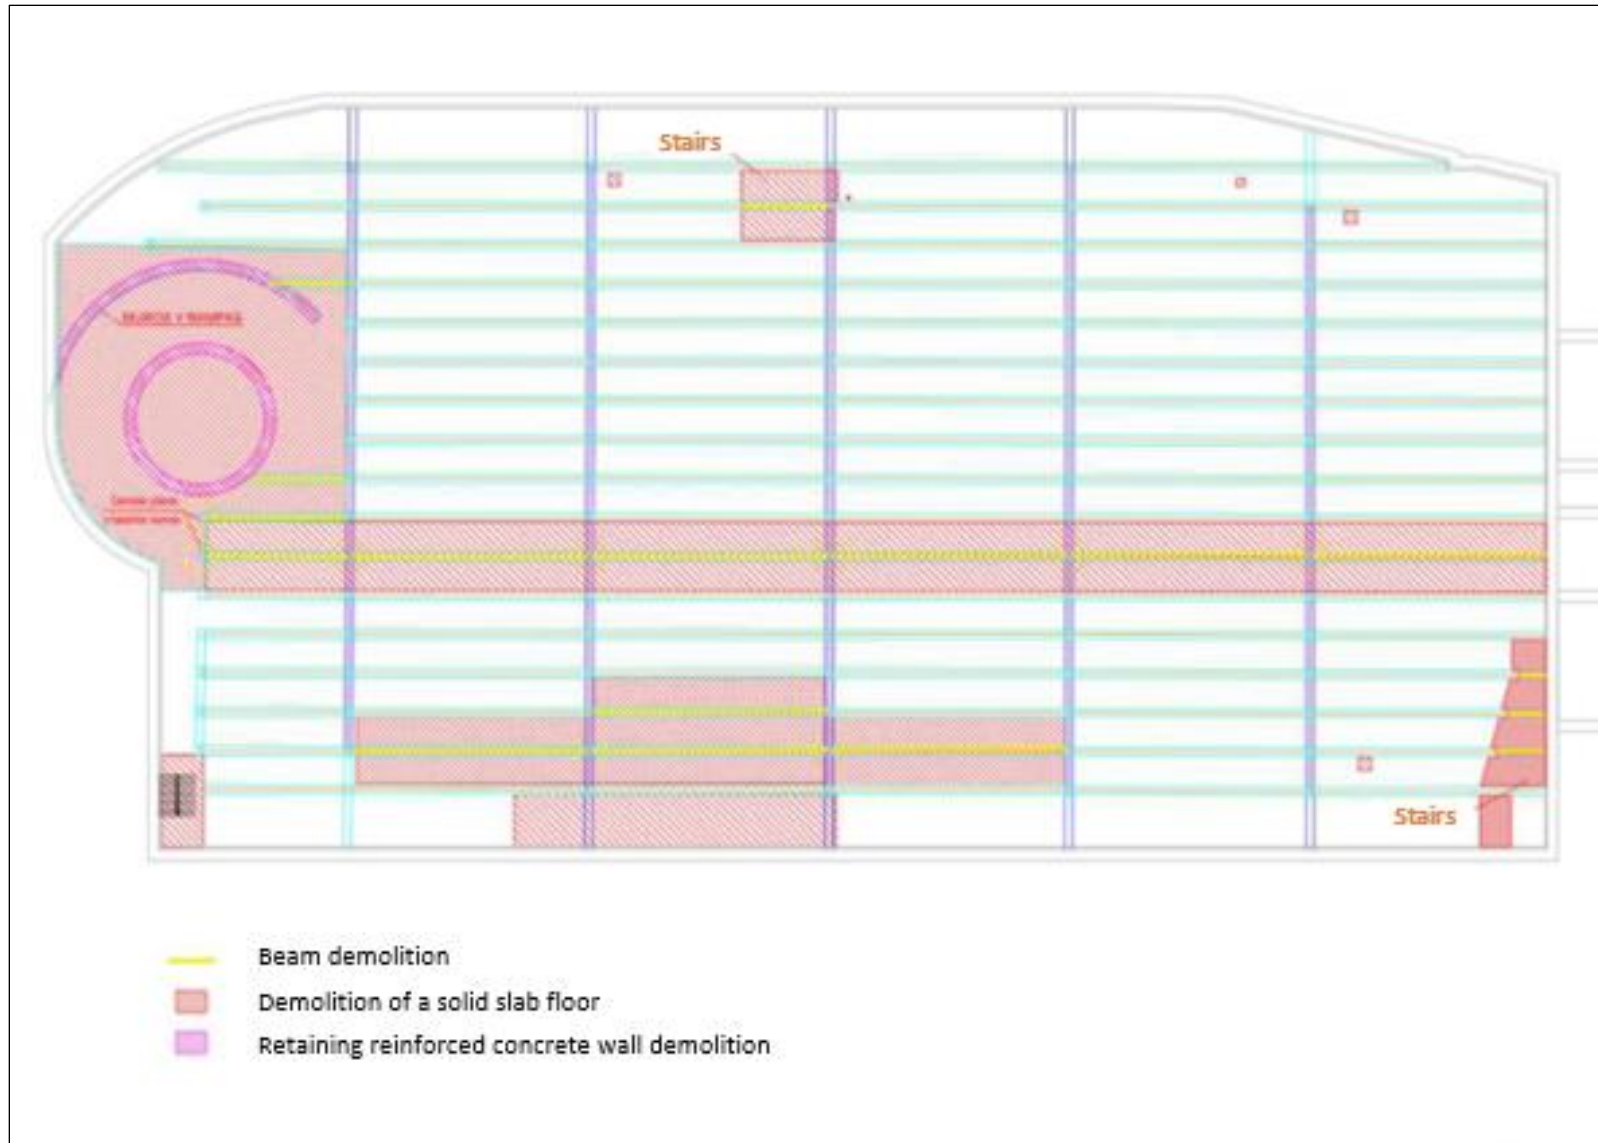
The structural plans of the new underground parking structure of the Plaza de la Reina.
